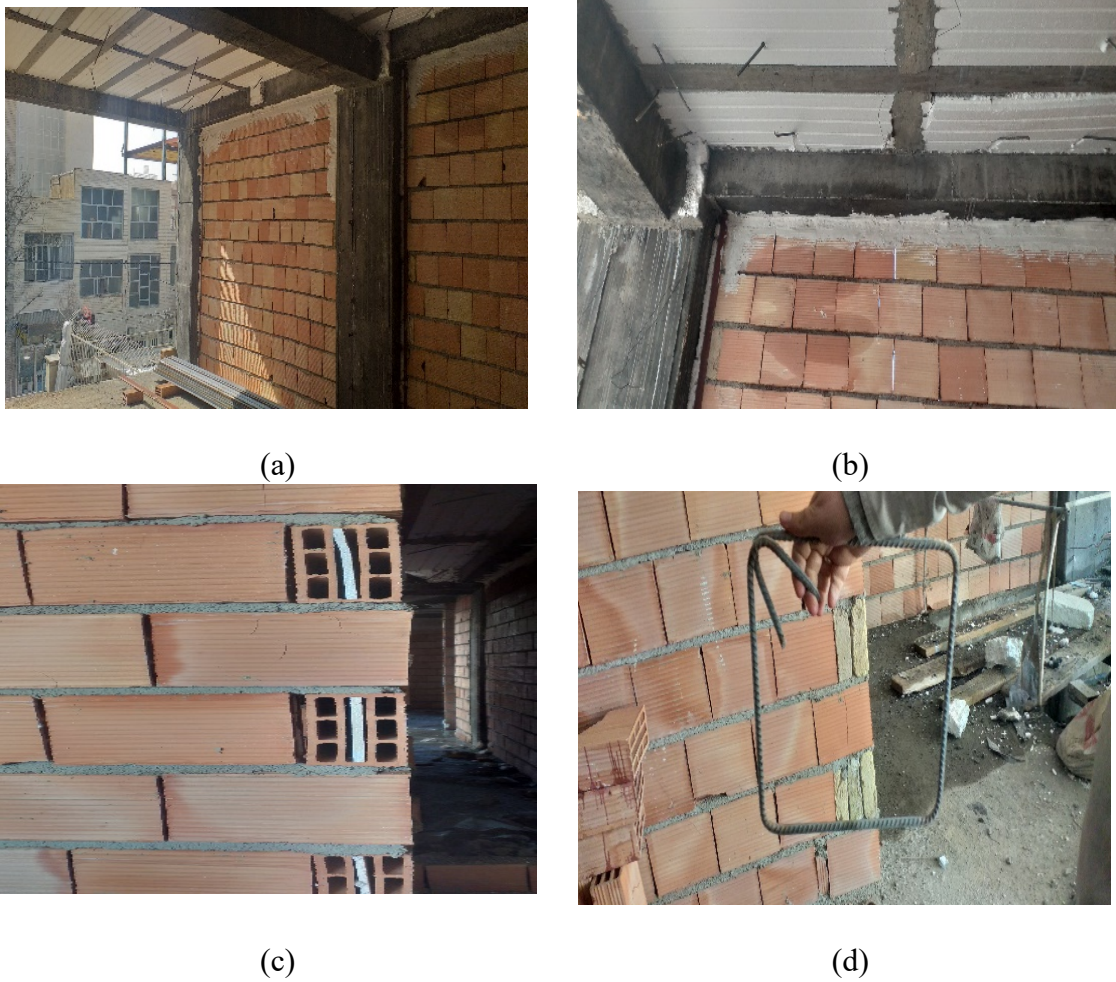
First building information: (a) bricks masonry blocks; (b) composite steel concrete precast beam with polystyrene foam blocks; (c) Polystyrene foam isolation; (d) rebar correct bending degree
